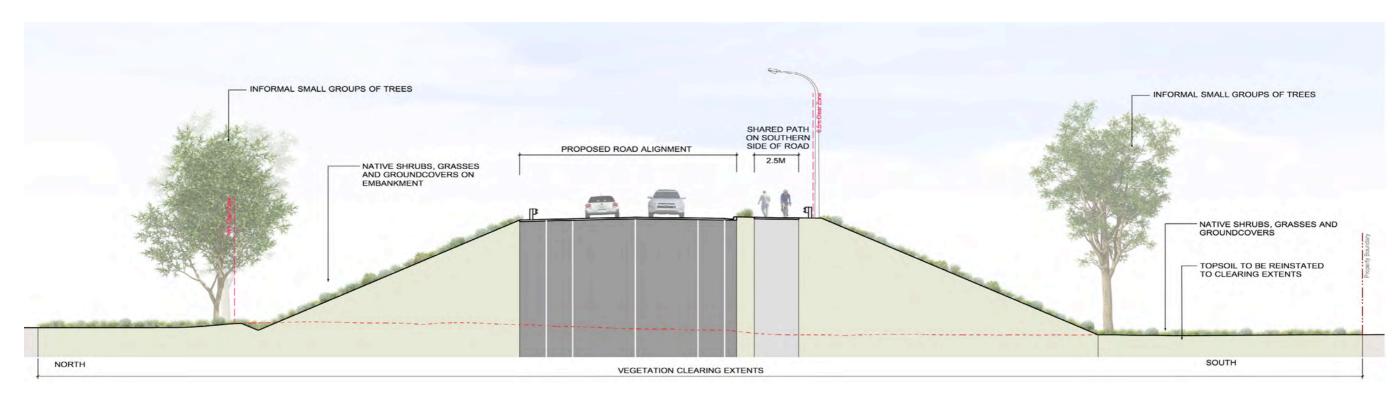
Typical cross section of Embankments treatment, shown at station 7,200 on the western approach to Bridge ST02
